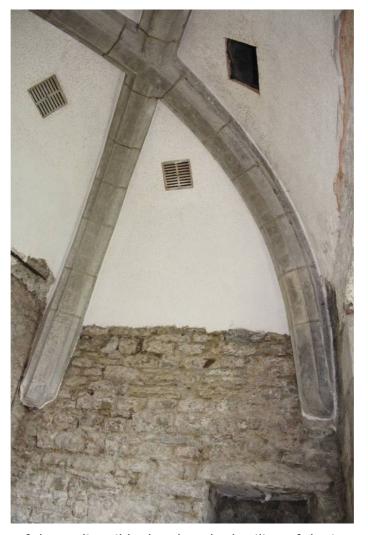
Part of the replica ribbed and vaulted ceiling of the Lower Floor of the Square Tower, facing northeast with small alcove below
